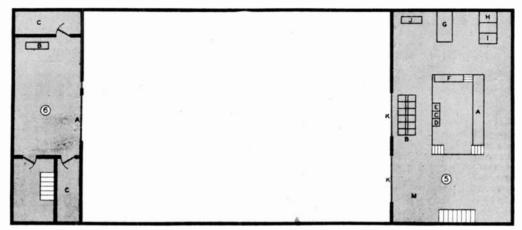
PLAN OF THE SPONSOR'S ROOM, 6, AND THE CONTROL ROOM, 5, AT THE REAR OF THE BUILDING
